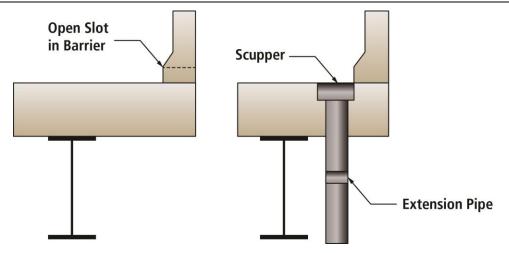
Schematic of an Open Deck Drainage System. Horizontal Penetration (left) and Vertical Penetration (right).
